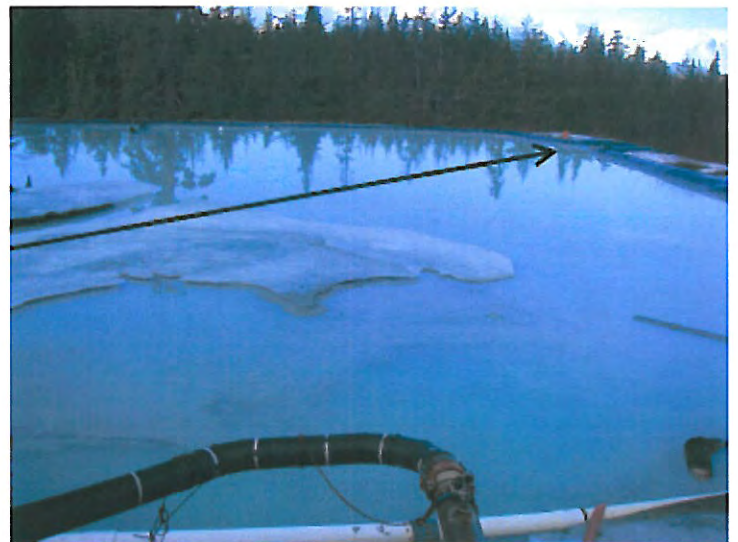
POND 1 LEVEL APPEARS CLOSE TO CRESTING SPILLWAY TO POND 2
